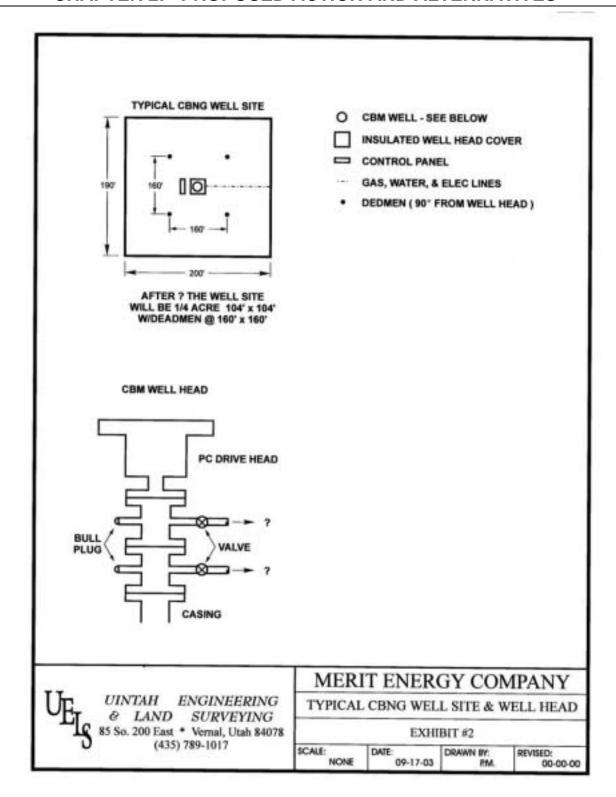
Typical CBM Drill Site Layout - Brown Cow Pod.
